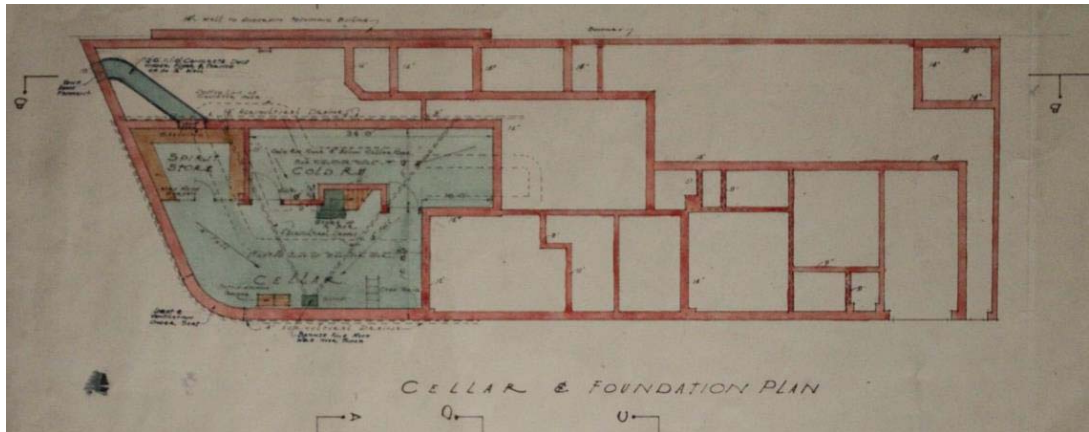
Extract from Building Application Plans comprising cellar & foundation plan, 1939. (Source: City of Sydney Archives, BA 266/39)
